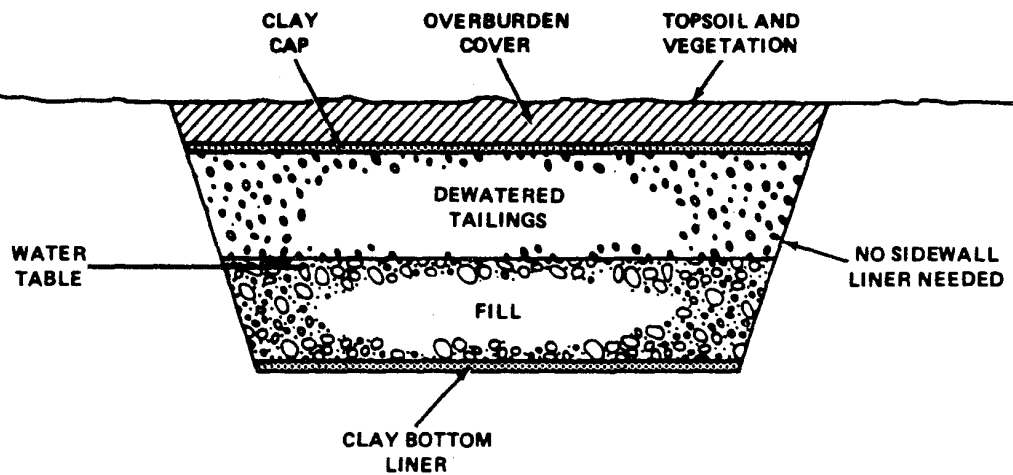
Disposal of Dewatered Tailings in Available Open Pit Mine
